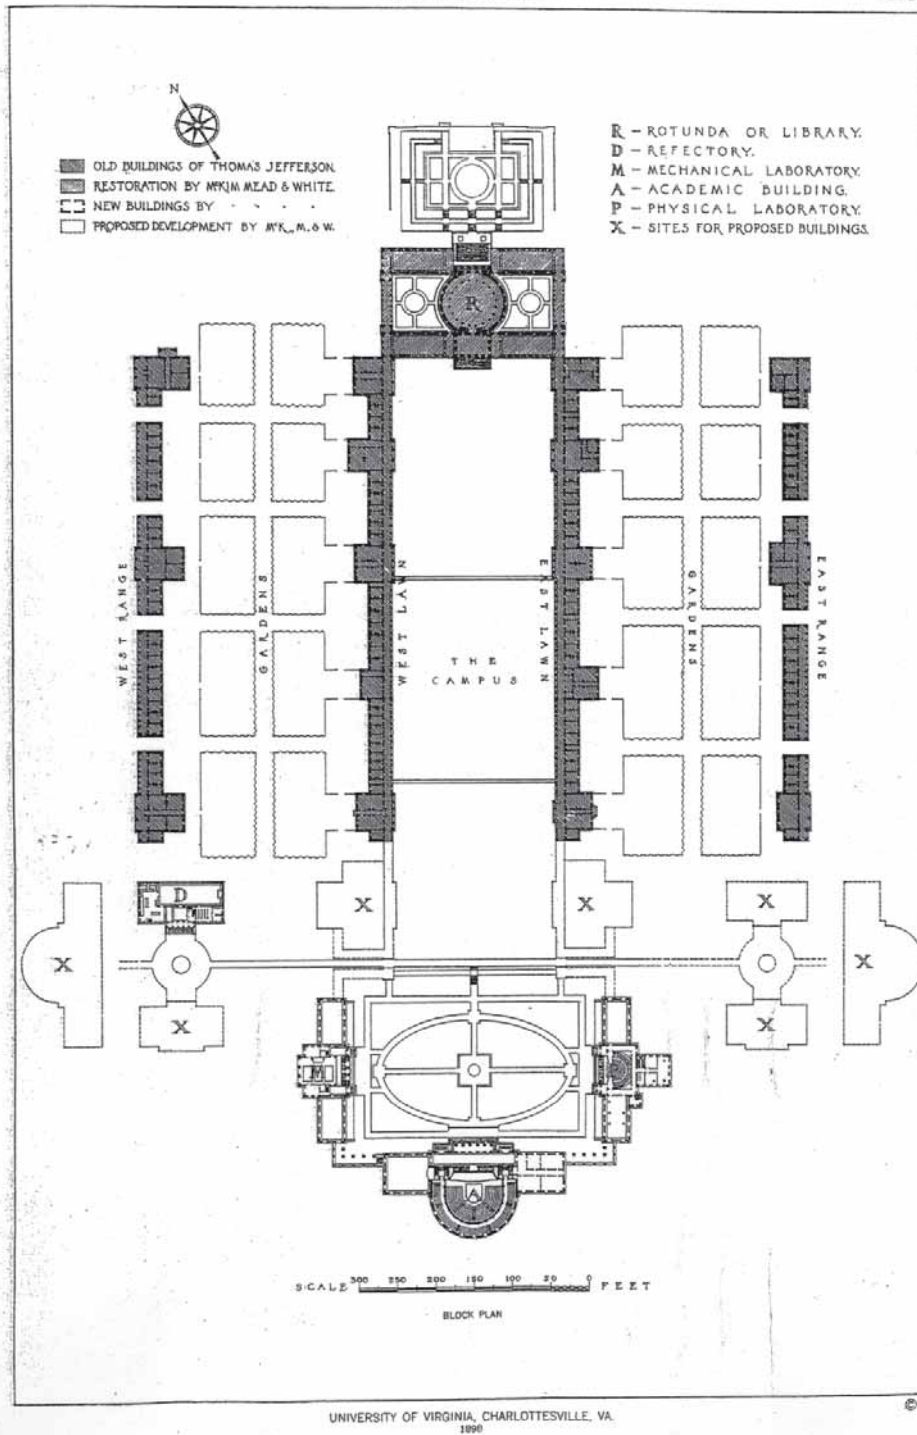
McKim Mead & White plan for the Lawn, including Cabell, Cocke, and Rouss Halls in 1898.
